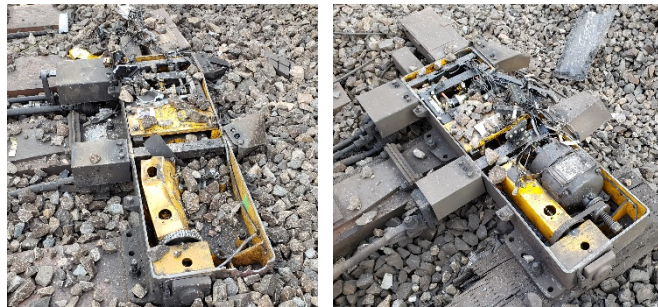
Damaged motor drives of point machine at turnouts P5108 (left) and P5112 (right)
